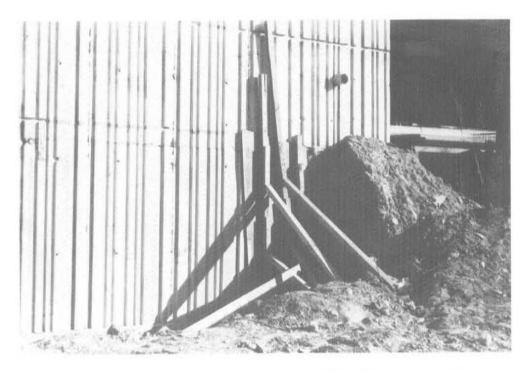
Support to Bridge Abutment for Refilling Rain Caused Crevice.
